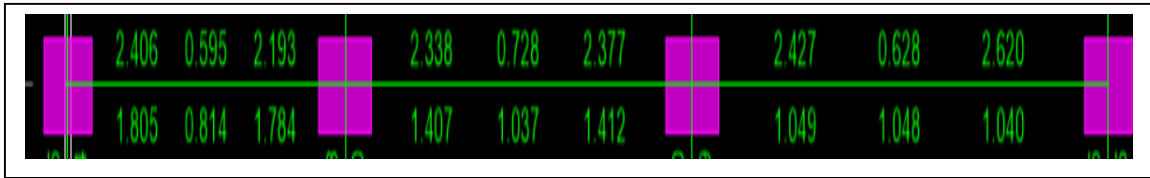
Steel Area of 1st Floor Beam X-axis
